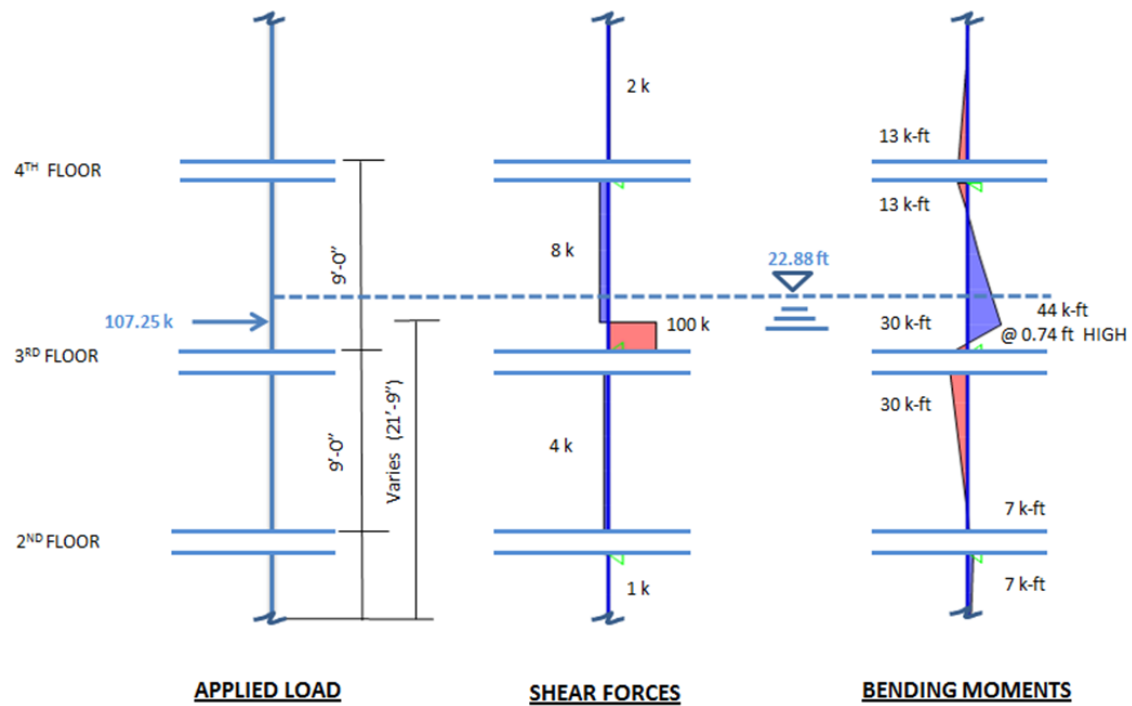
Impact load applied at d away from the end of column on the 3rd floor
